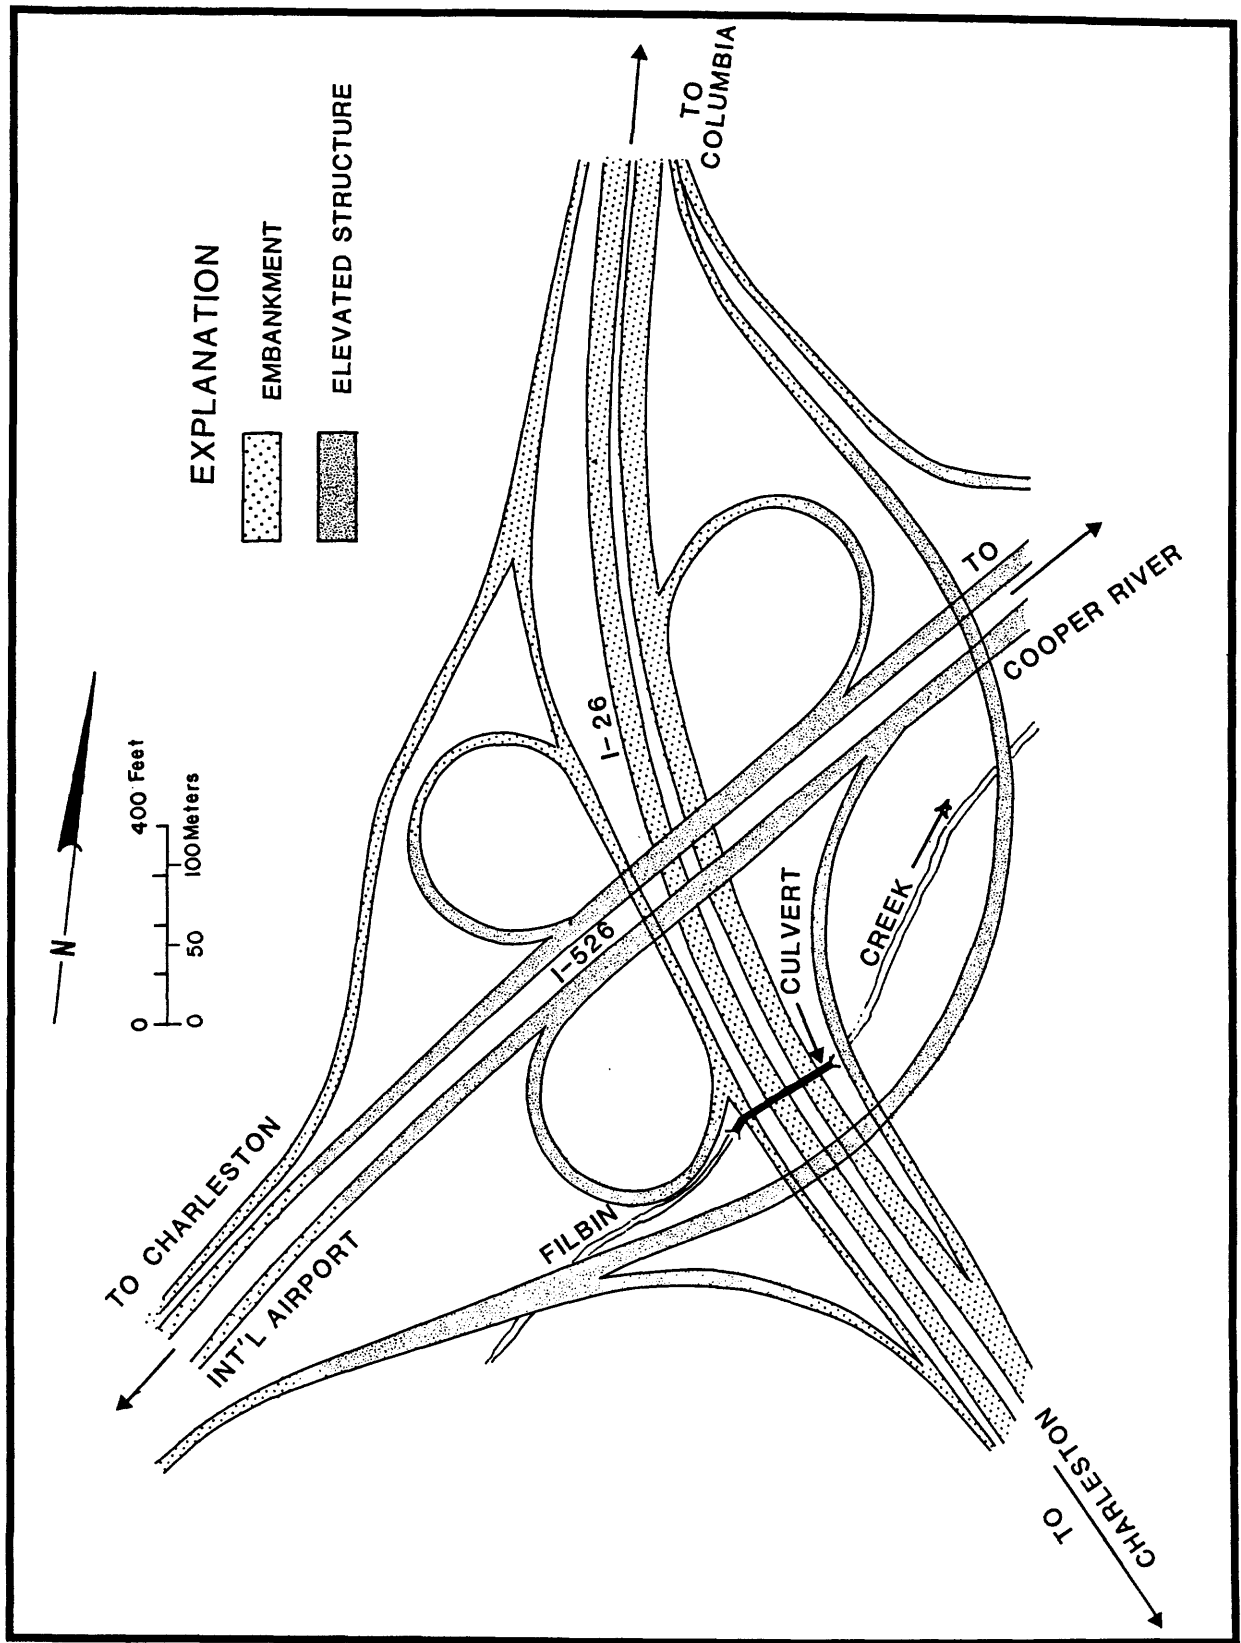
Filbin Creek at proposed I-26/I-526 interchange, construction alternative B.
